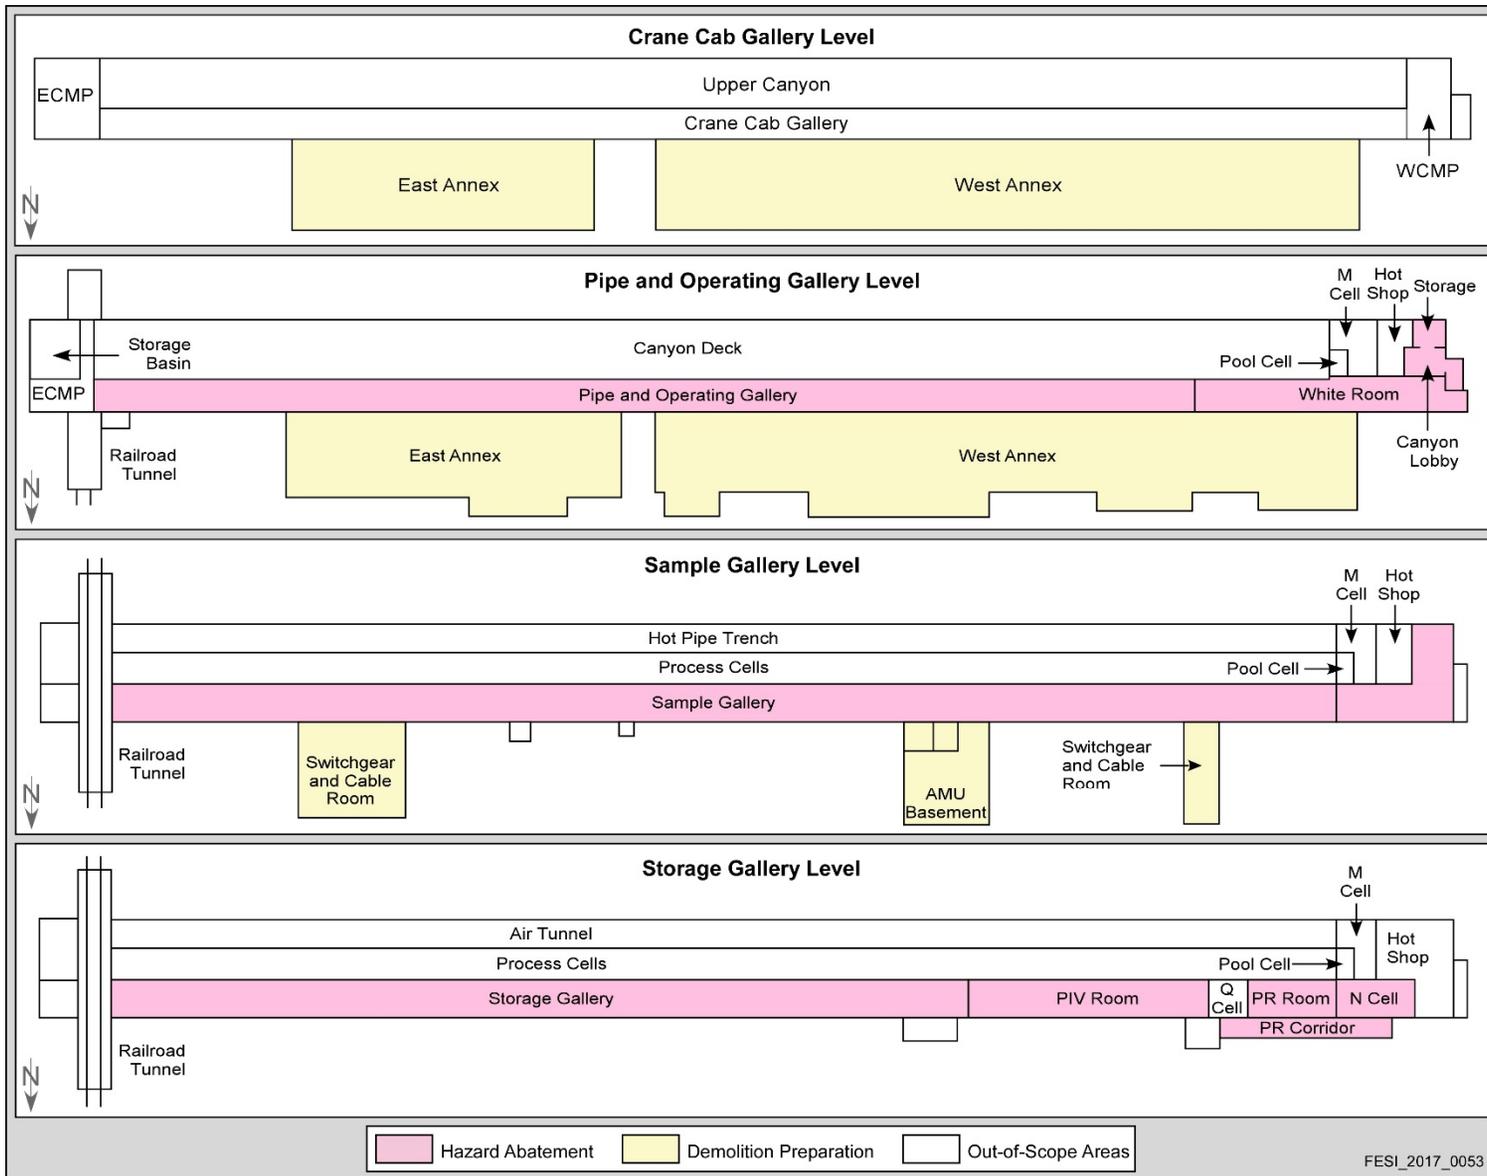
Alternative 3 Plan View - Proposed Actions per Level
